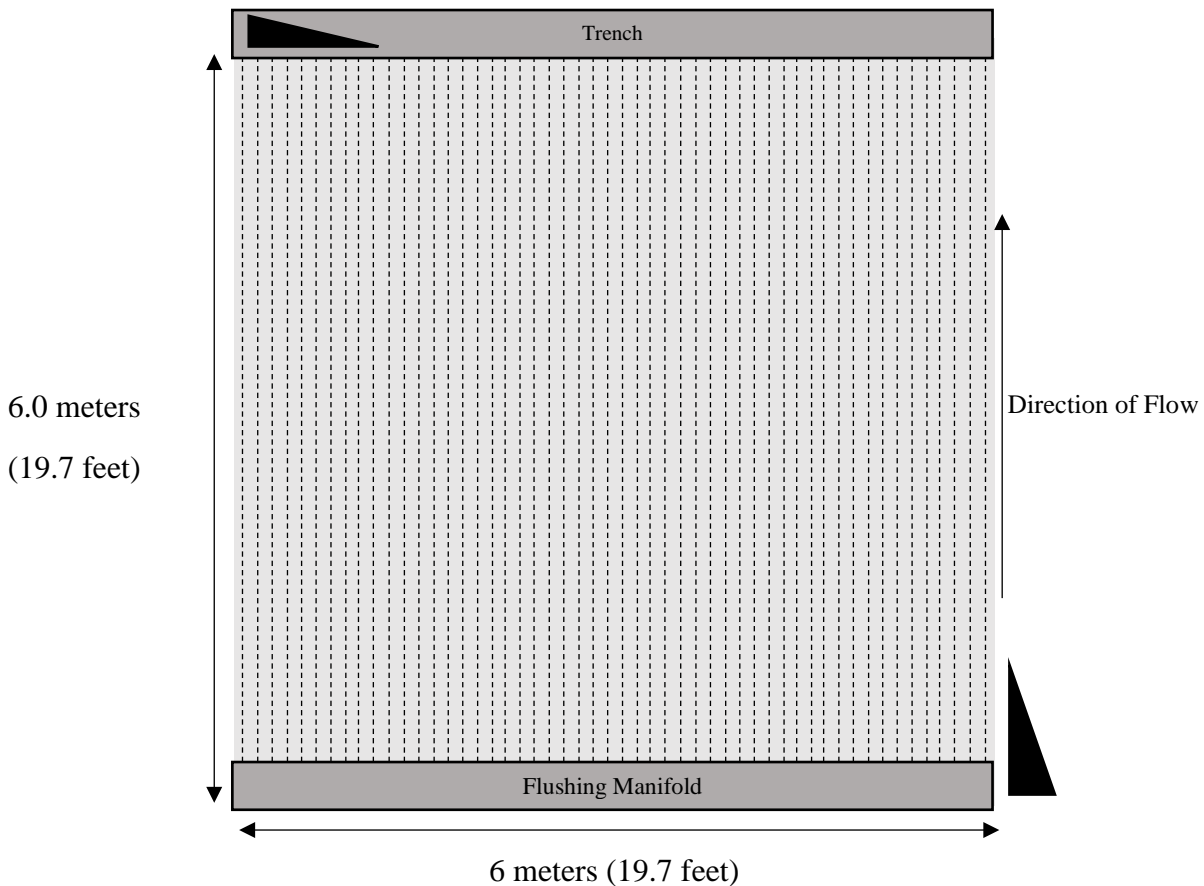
Safespill Test Facility outside of Houston, TX, USA
